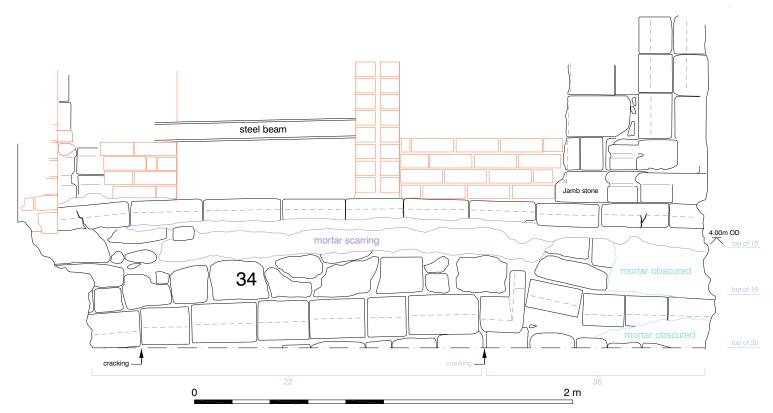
W.facing elevation of C13th masonry (S:6). Scale 1:20
